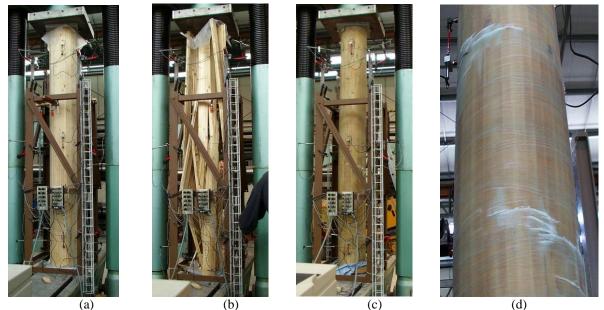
Failure modes of unreinforced and composite reinforced tubes: (a) REF before testing, (b) splitting of REF, (c) local buckling of tube CR85 and (d) detail of CR85 – crushing of wood and glass fibres.
